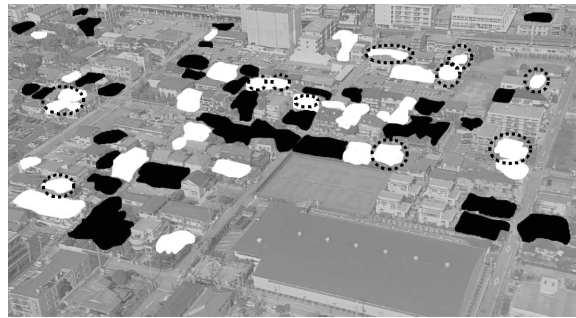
Distributions of collapsed and severely damaged buildings in Fig.14 by ground survey.
